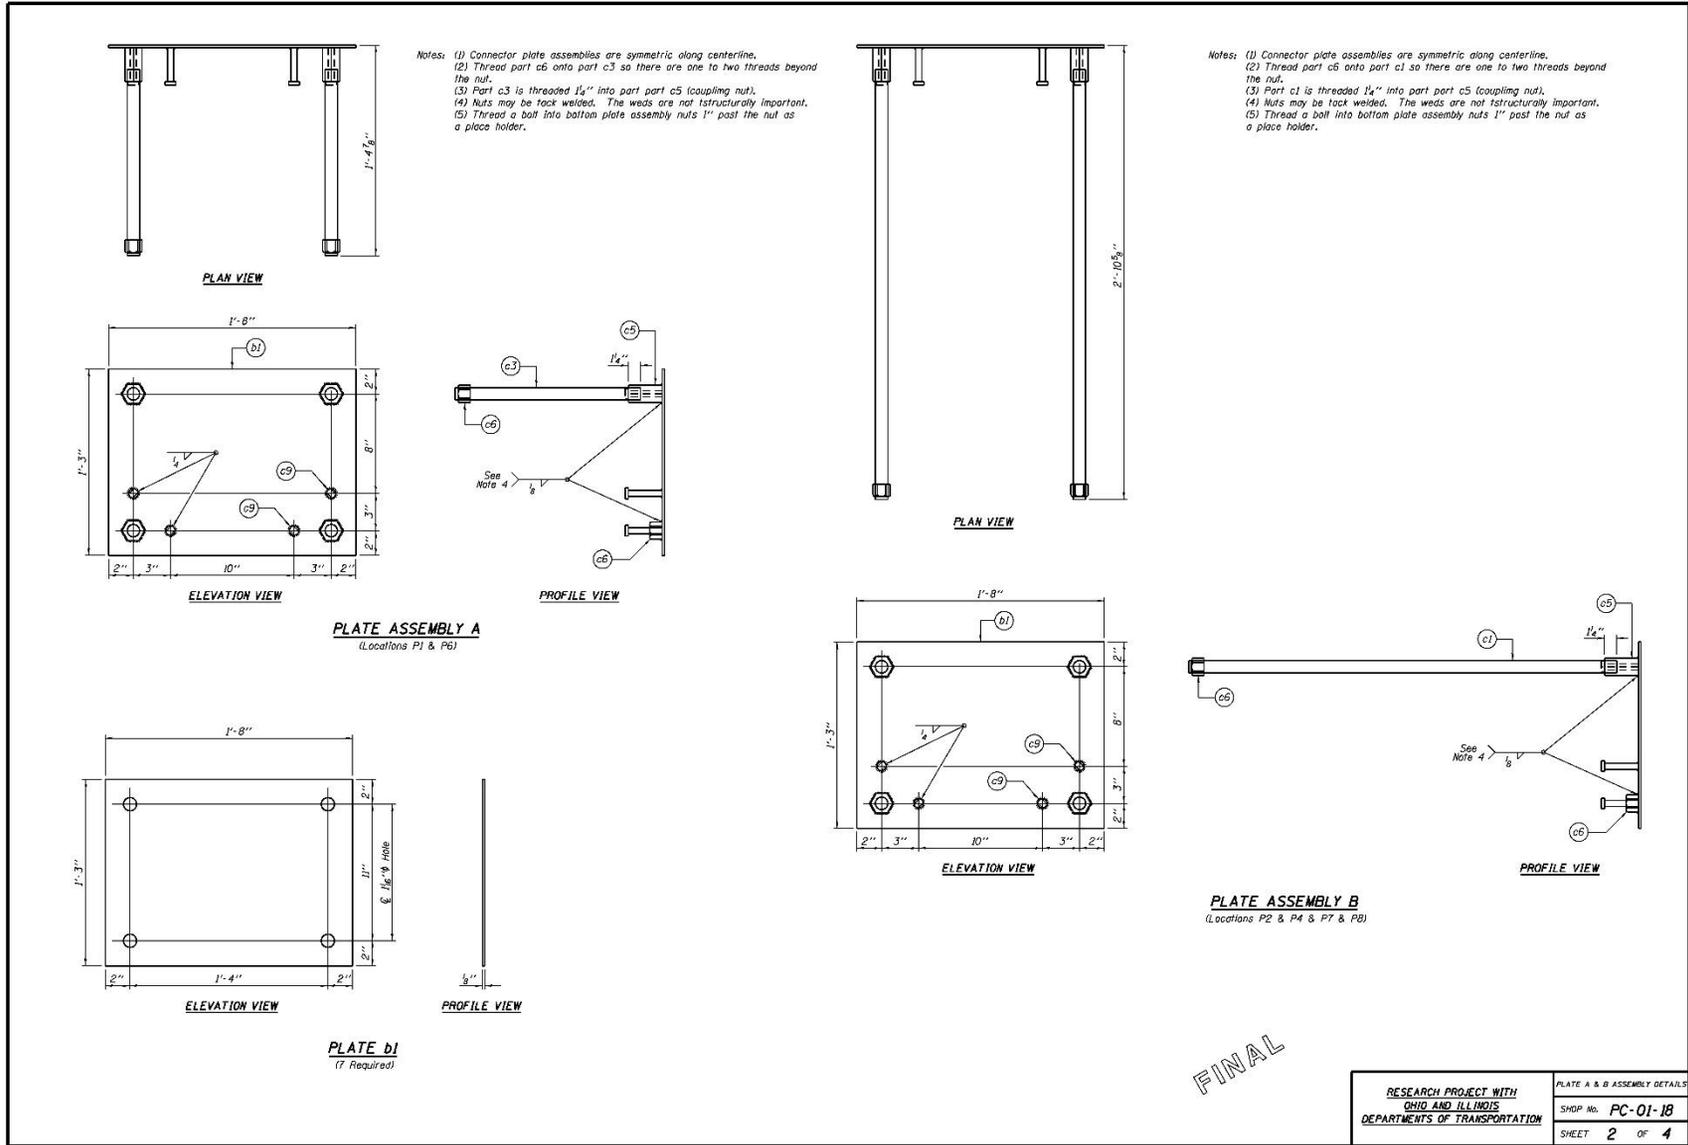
Illini Concrete Box-Beam Girder Details, Sheet 2 of 4
